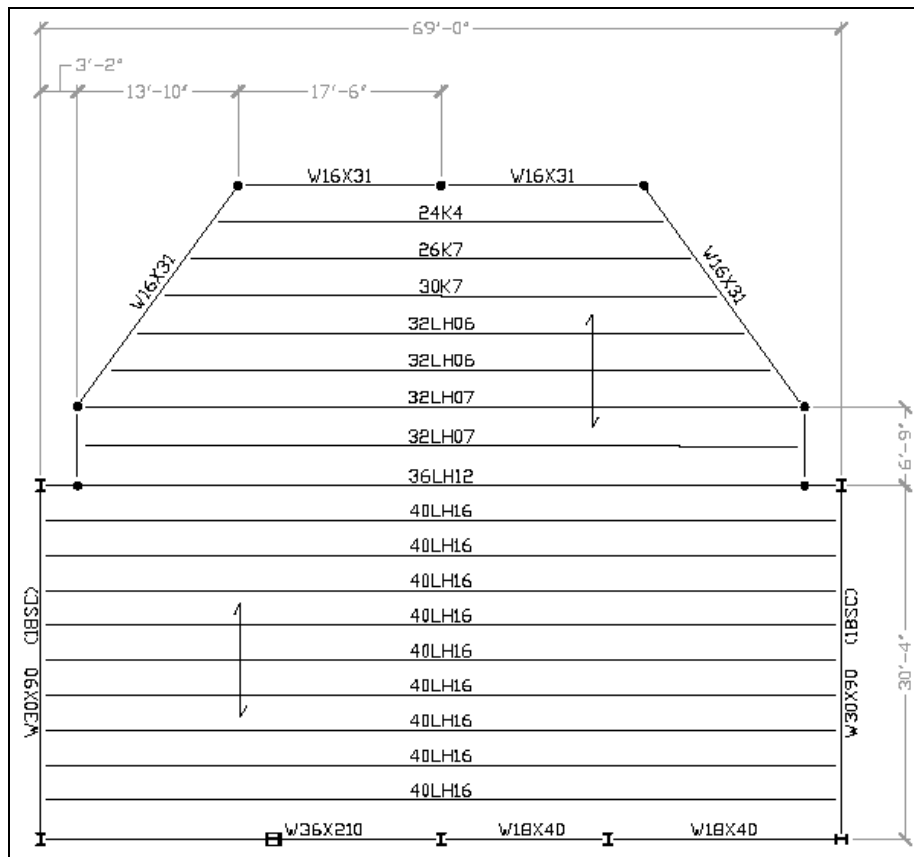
Partial 2nd Floor Framing Plan – Long Span Joists
